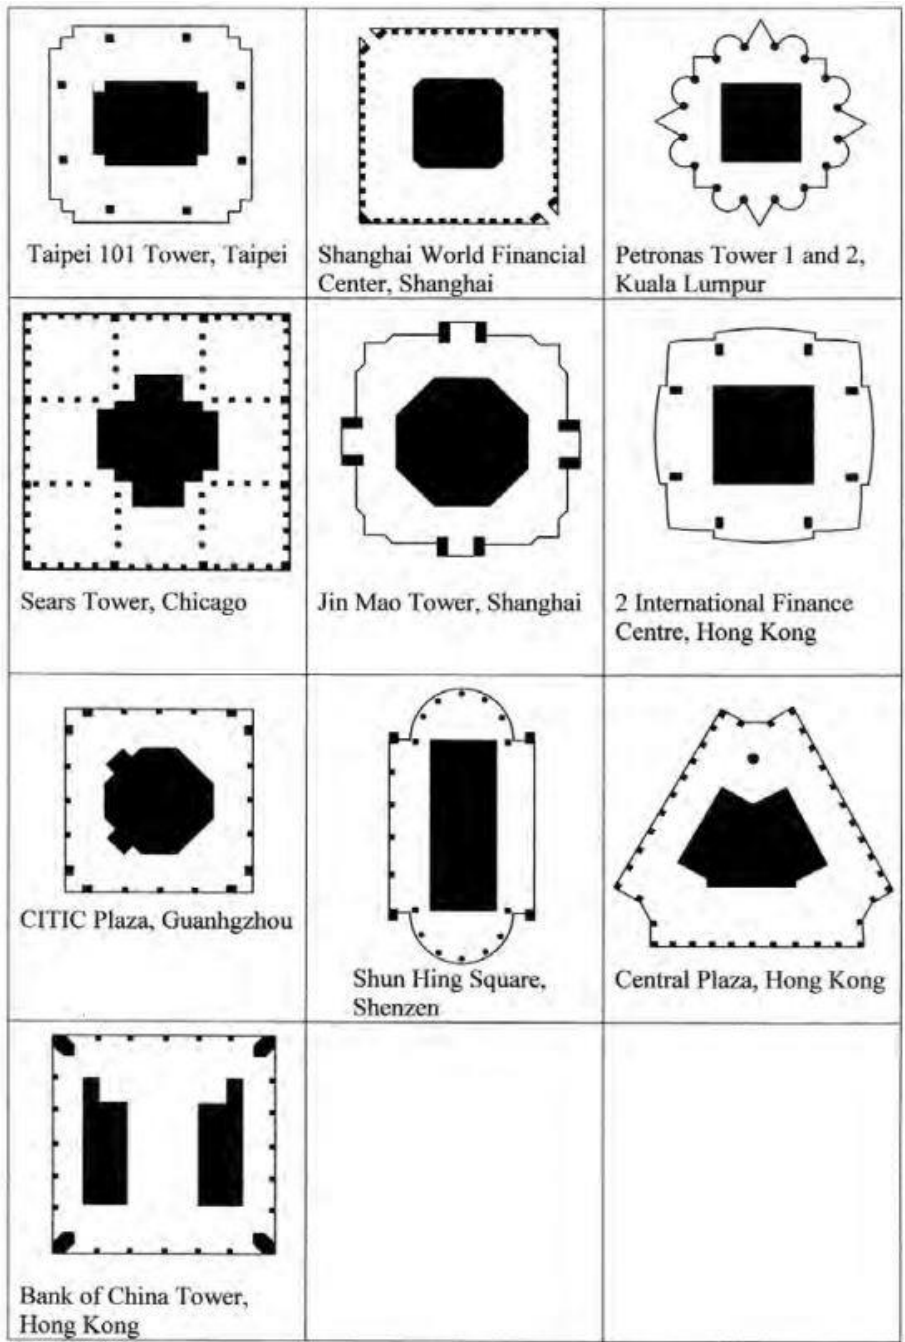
Geometry of typical floor plans of ten tall office buildings around the world (Sev & Özgen, 2009)
